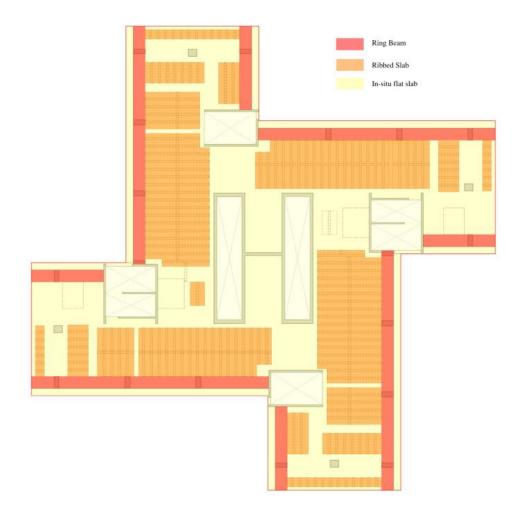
Typical existing structural floorplate with highlighted ribbed slabs
